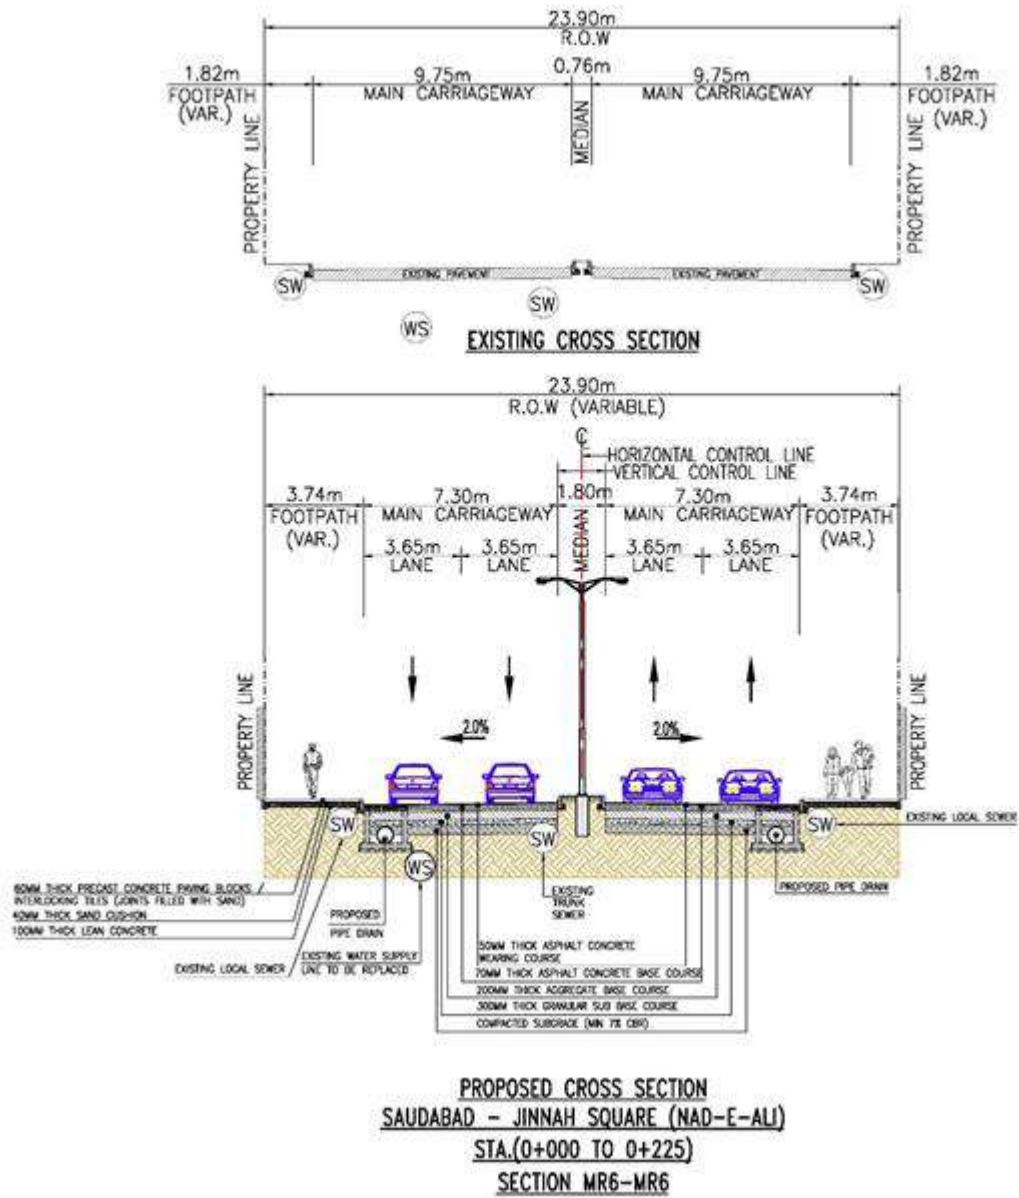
Existing and proposed water supply and sewerage system from Saudabad Chowrangi to Jinnah Square
